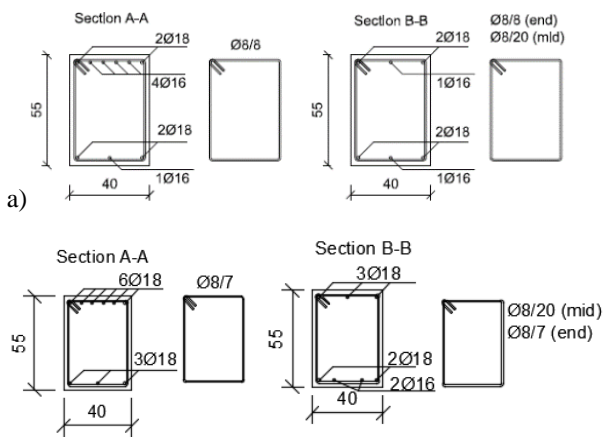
Sections of beams designed using a) B450 C and b) DPF steel reinforcing bars.
